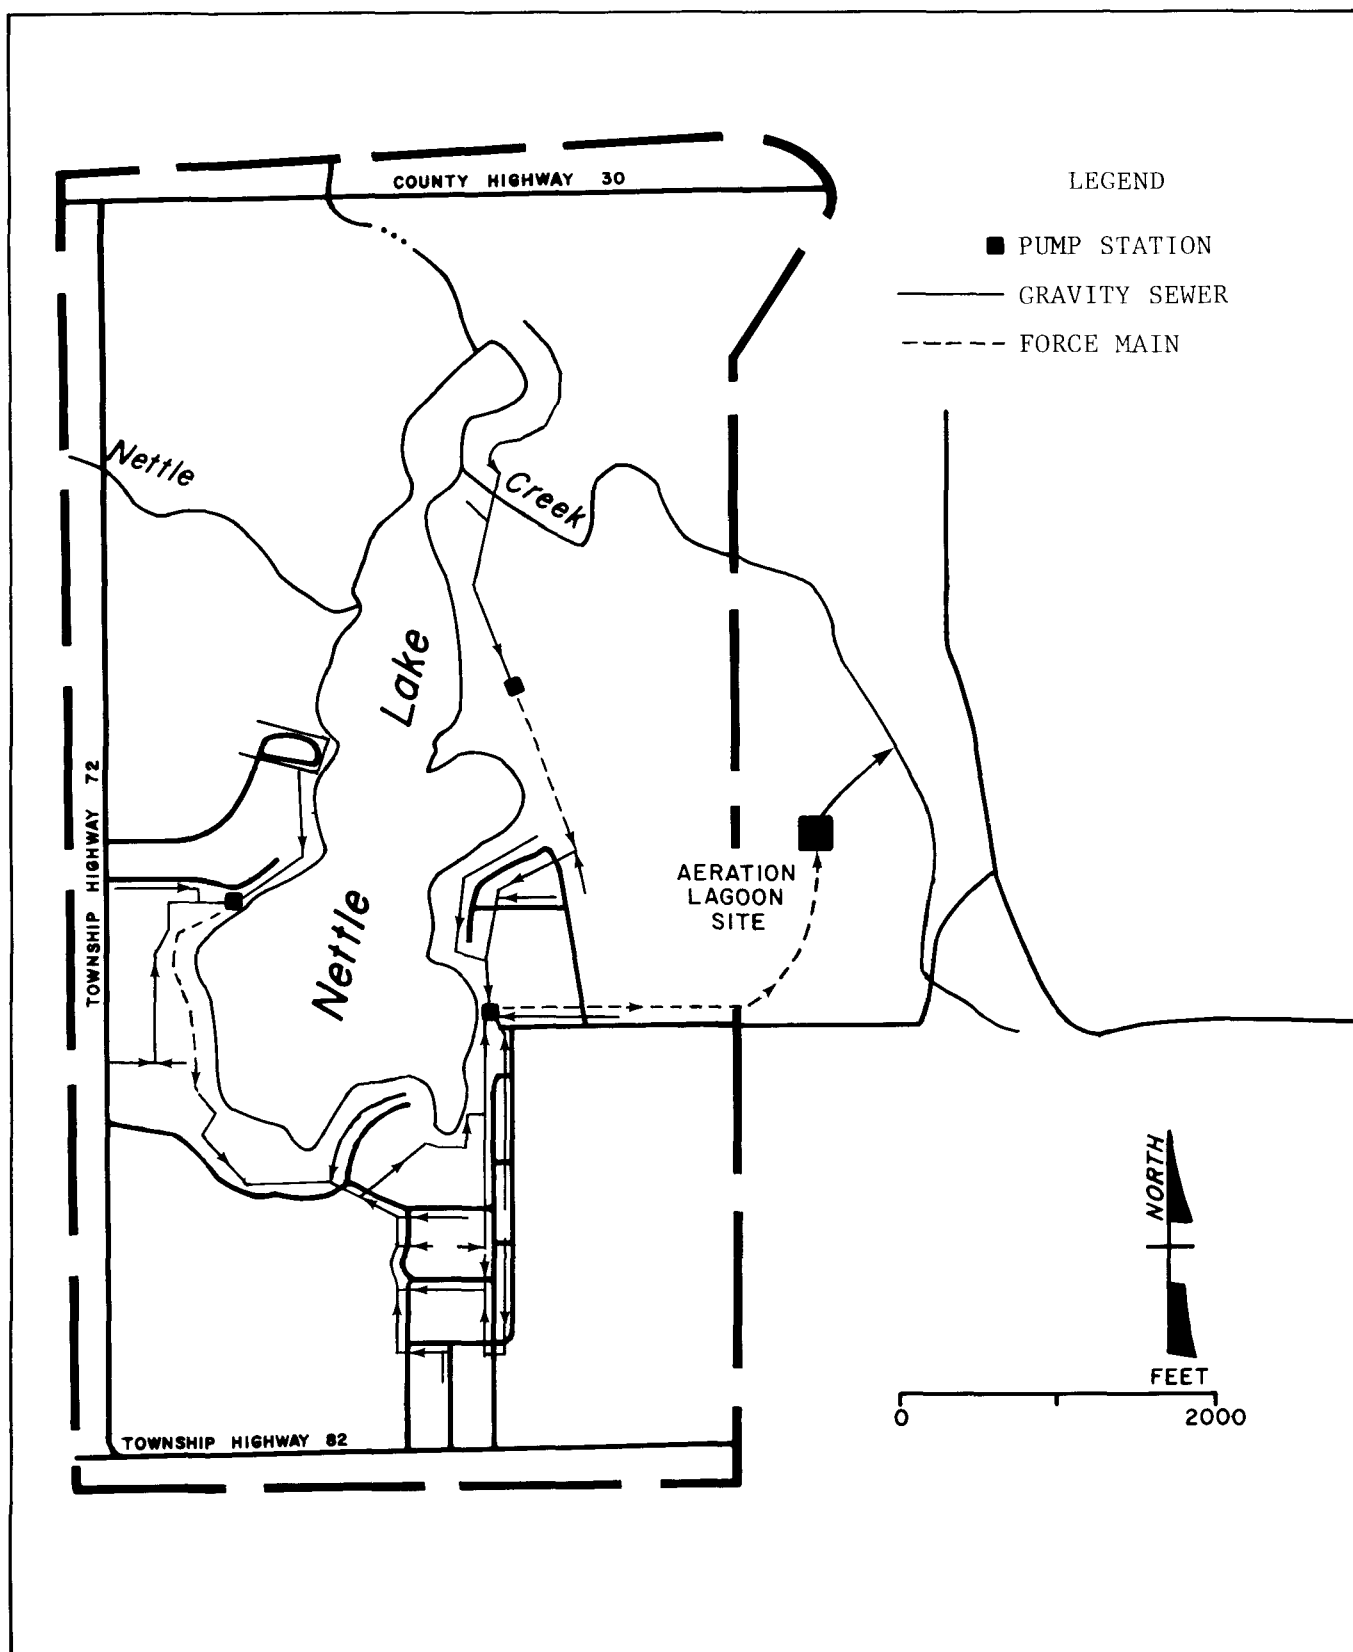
NETTLE LAKE: FACILITIES PLAN PROPOSED ACTION
